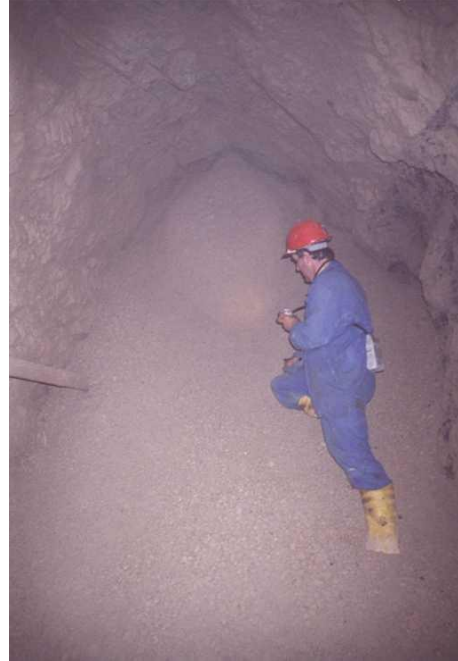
Underground stower Fig 6.2. Reinforced backfill
